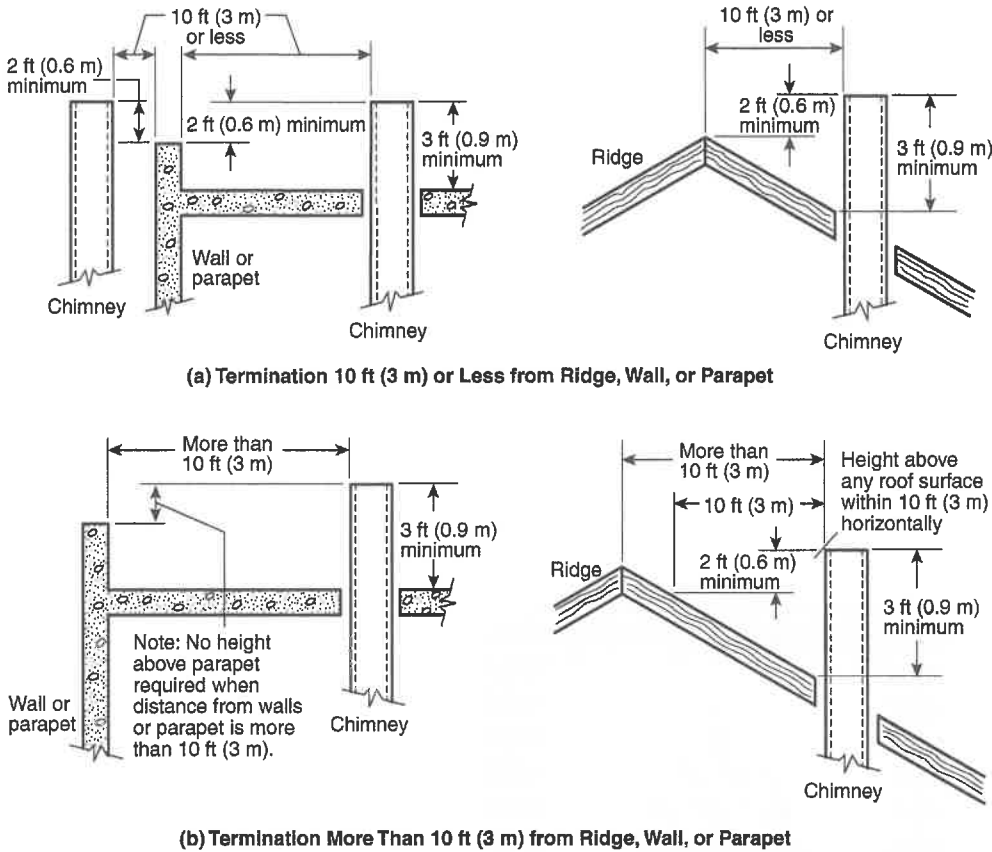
Typical Termination Locations for Chimneys and Single-Wall Metal Pipes Serving Residential-Type and Low-Heat Appliances.
